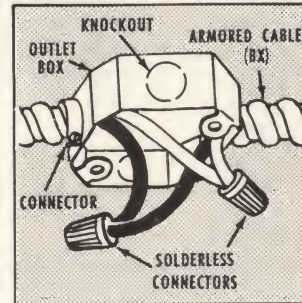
TYPICAL SOLDERLESS CONNECTORS
